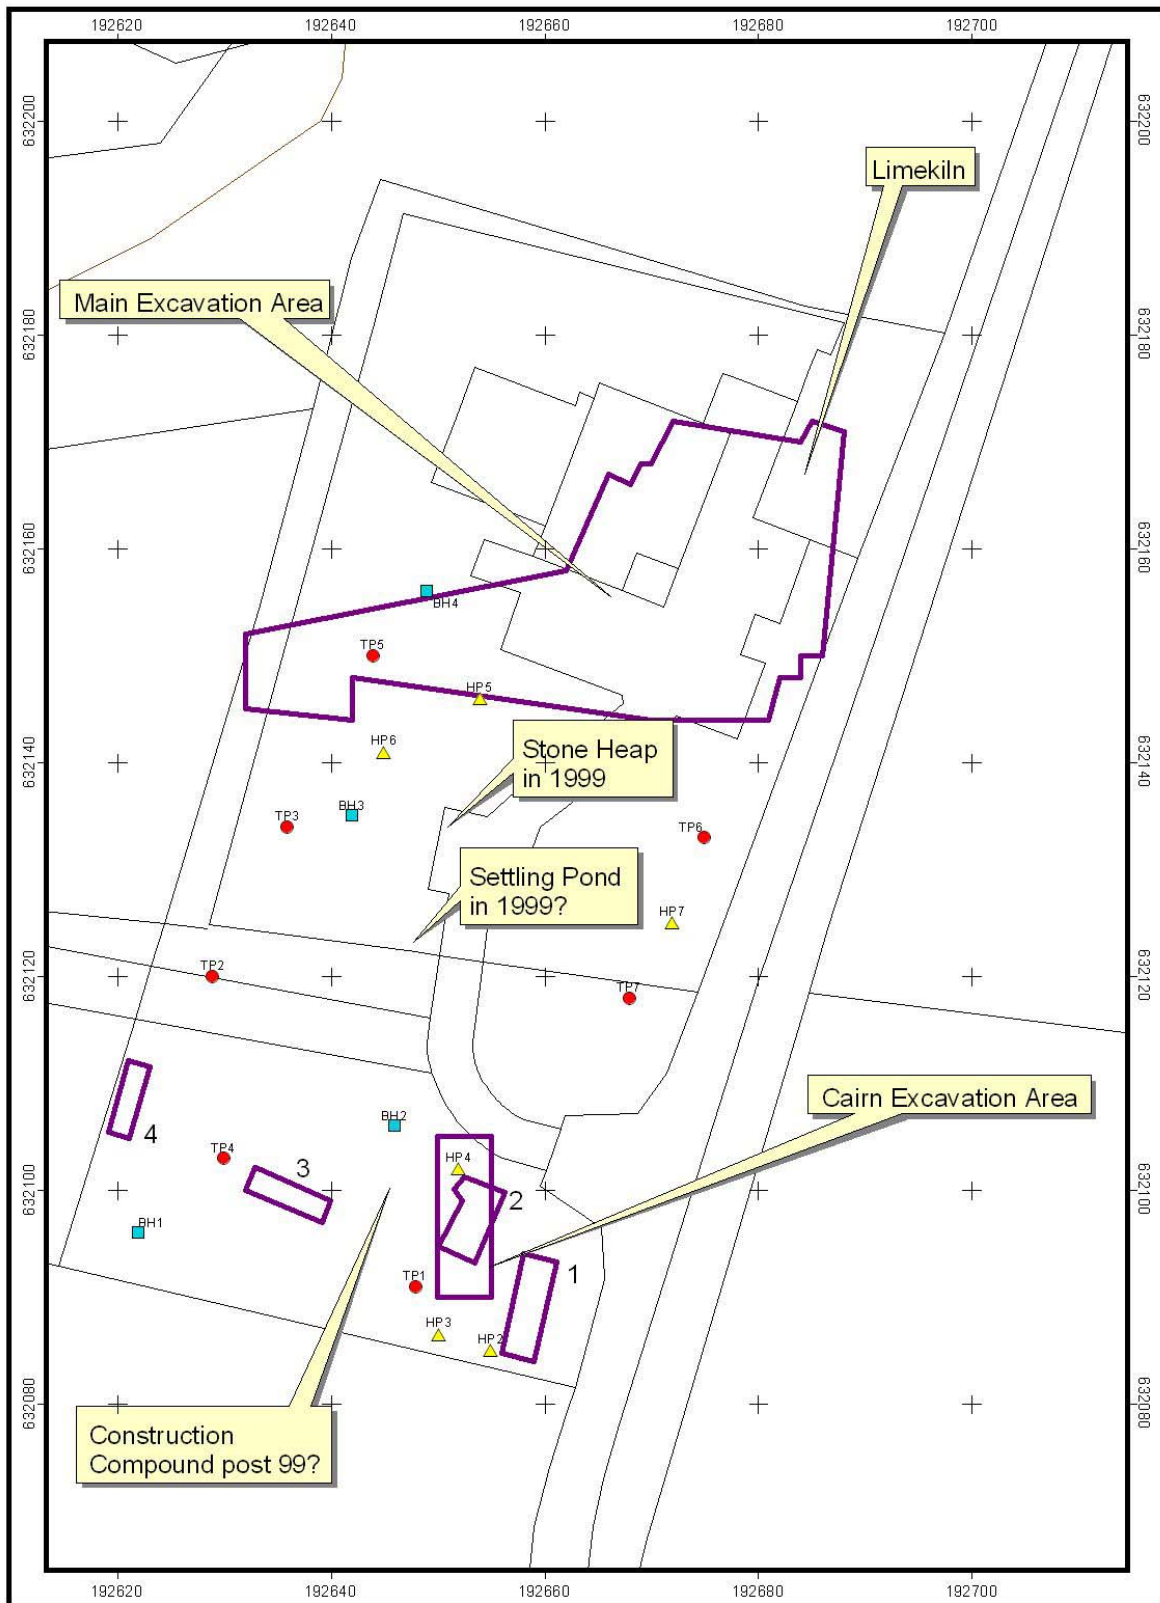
Site Plan of SI works and known extents of FIRAT excavation works
